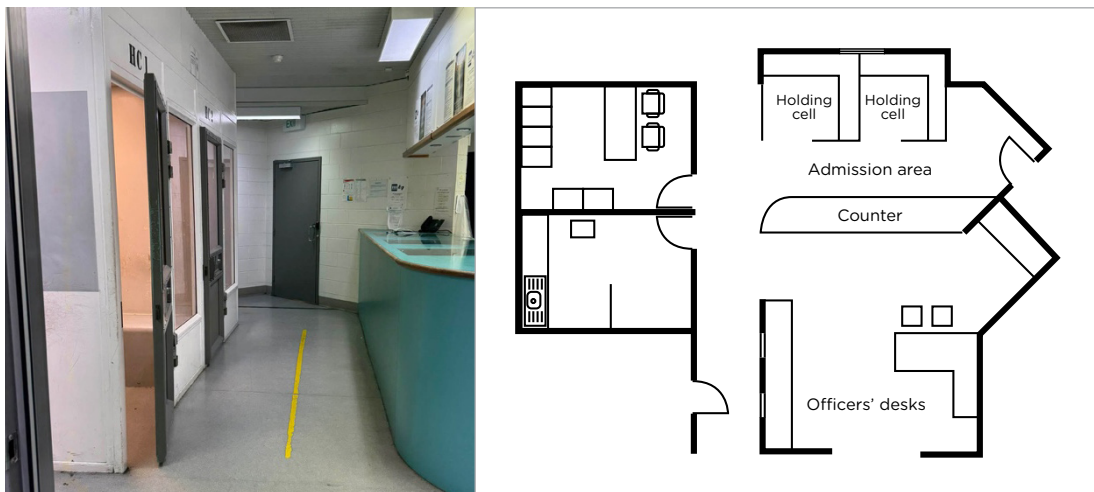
The admission area of the Cairns watch-house. Figure 7 - Plan of Cairns watch-house
